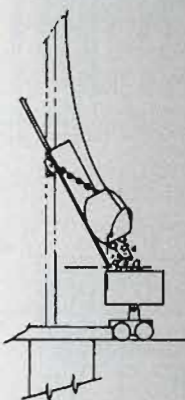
The gallows frame (headframe) and hoist house are shown in the plan on pages 38 and 39. These diagrams show how the bucket-dumping device worked.
